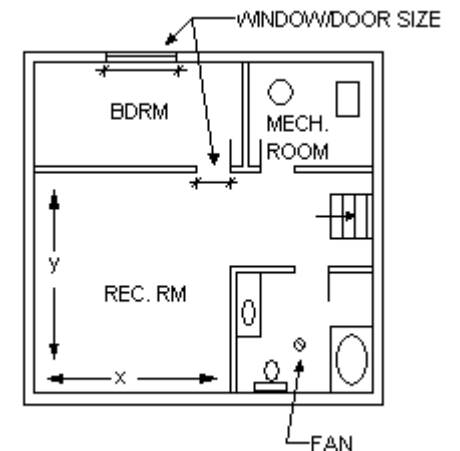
Basement Window Requirements for Habitable Rooms (Example Only)
